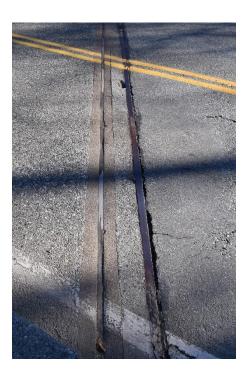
Asphalt Deterioration at South Abutment Joint
